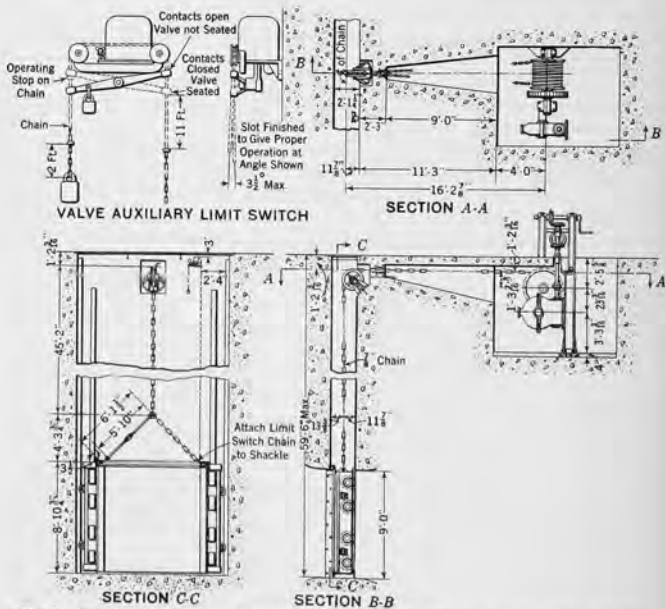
ILLINOIS WATERWAY: MACHINERY AND METHODS FOR OPERATING LOCK VALVES.
